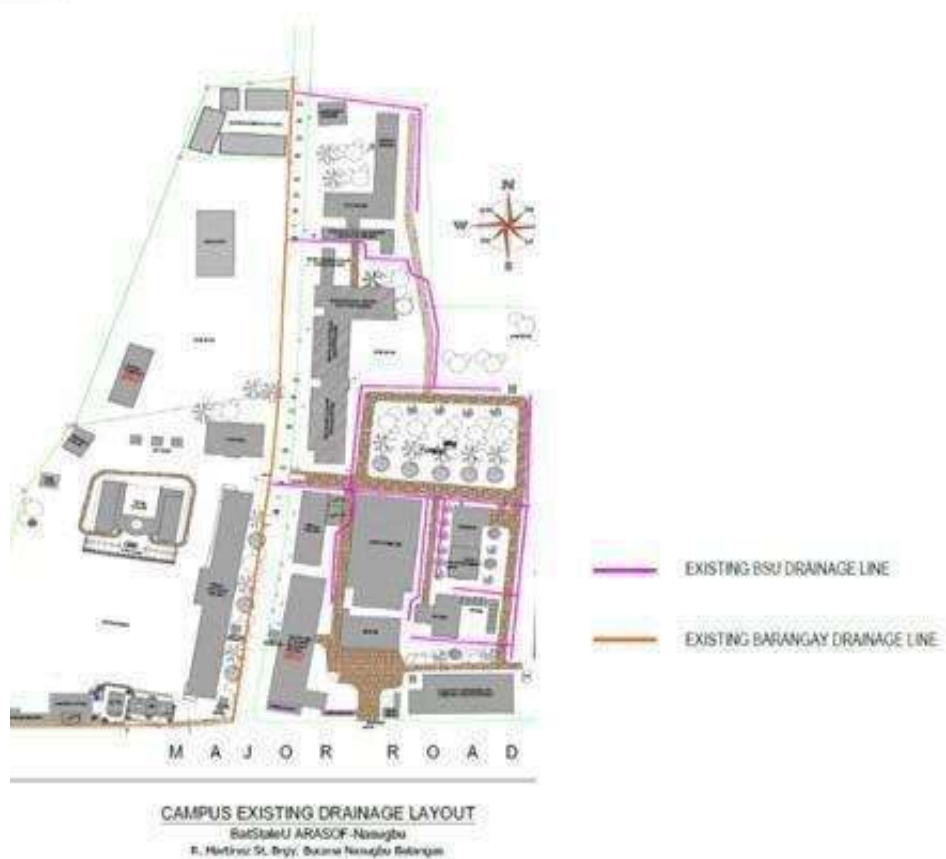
BatStateU ARASOF-Nasugbu Drainage Plan
